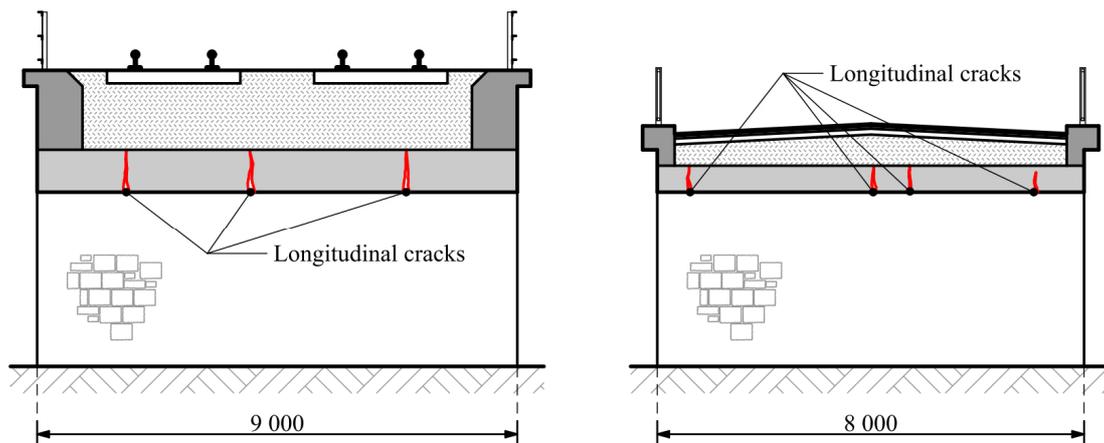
Railway (on left side) and road (on right side) masonry arch bridges; barrel vaults were cracked in the longitudinal direction.
